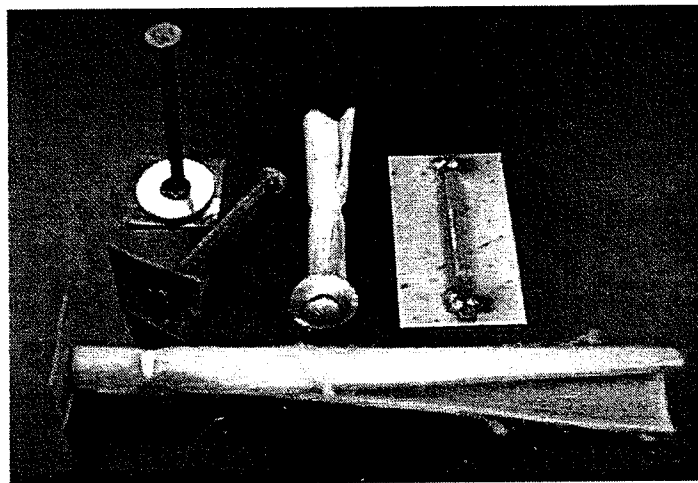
Drive plates with supporting washer (upper left), carriage bolt used for driving (center), drive plate attached to rolled wick (bottom), and standard drive plate for vertical wick drain installation (upper right).
